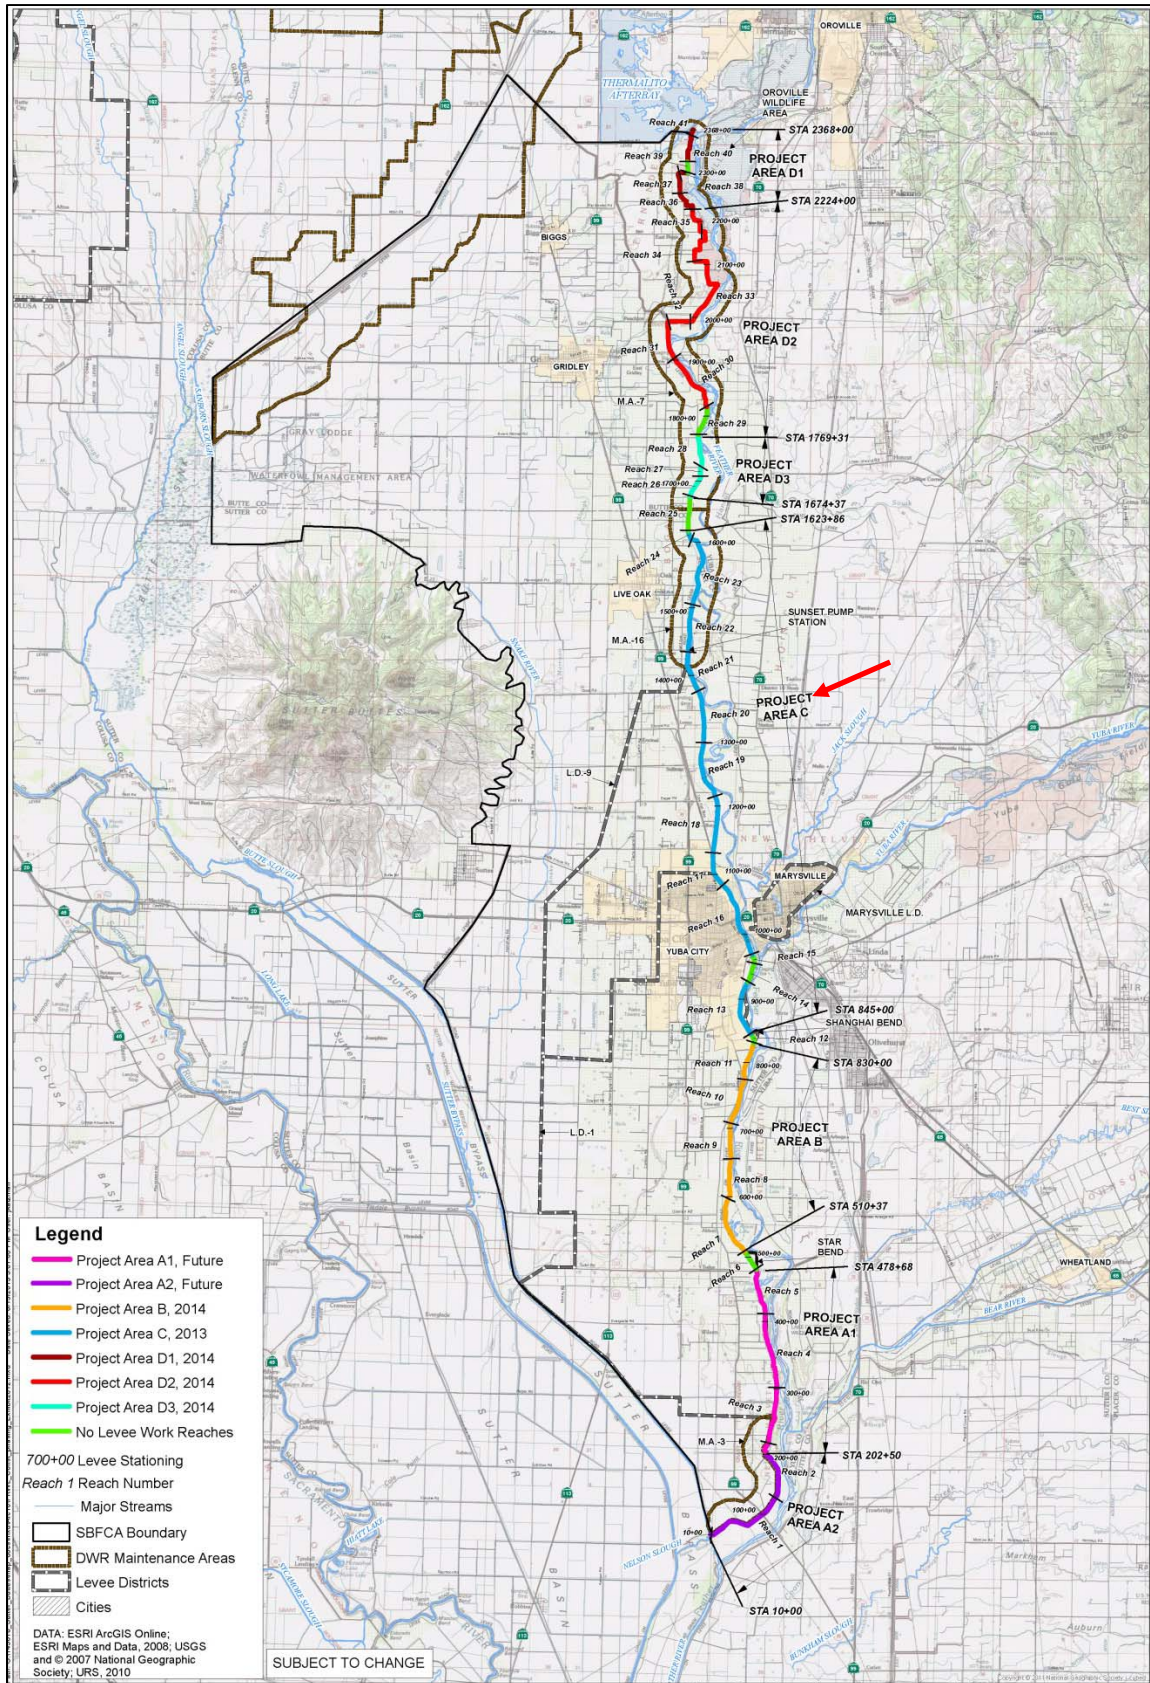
SBFCA FRWL Construction Phasing Plan (Source: HDR, August 2013)
